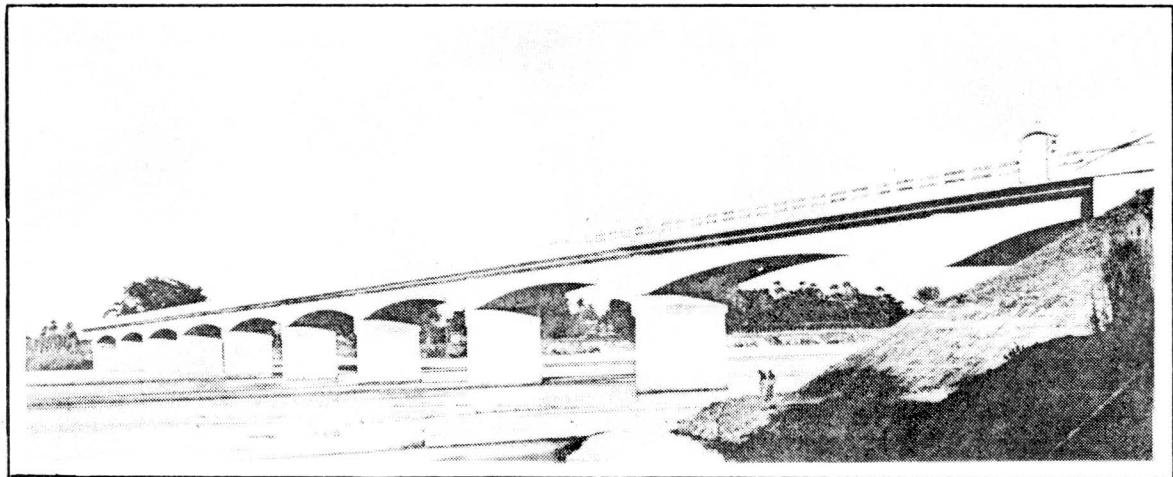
·2 MULTISPAN BALANCED CANTILEVER BRIDGE
